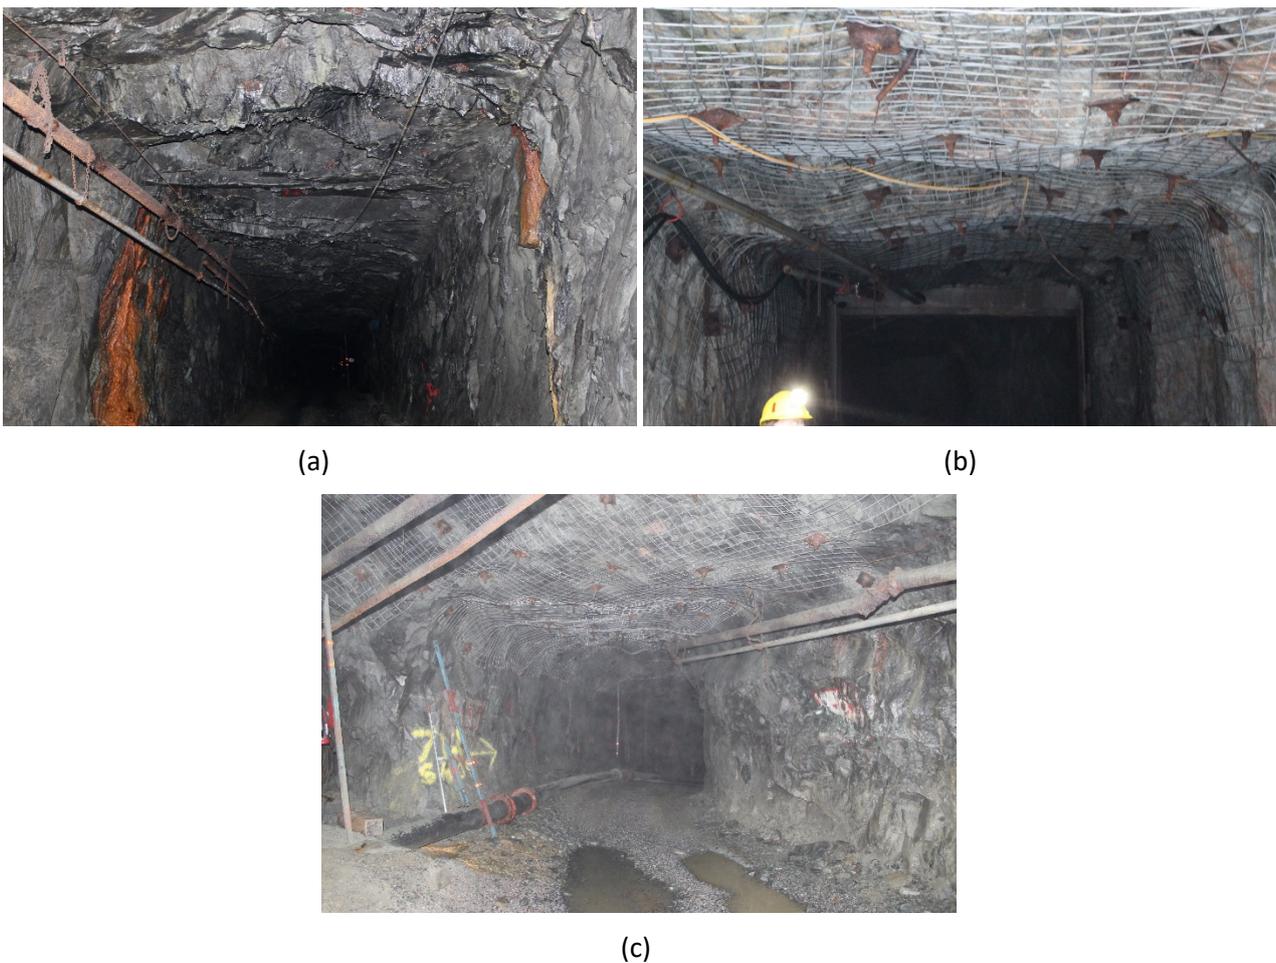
(a) Spot bolting ground support; (b) Systematic bolting and welded wire mesh ground support; (c) Systematic bolting and welded wire with longer bolts for intersection support
